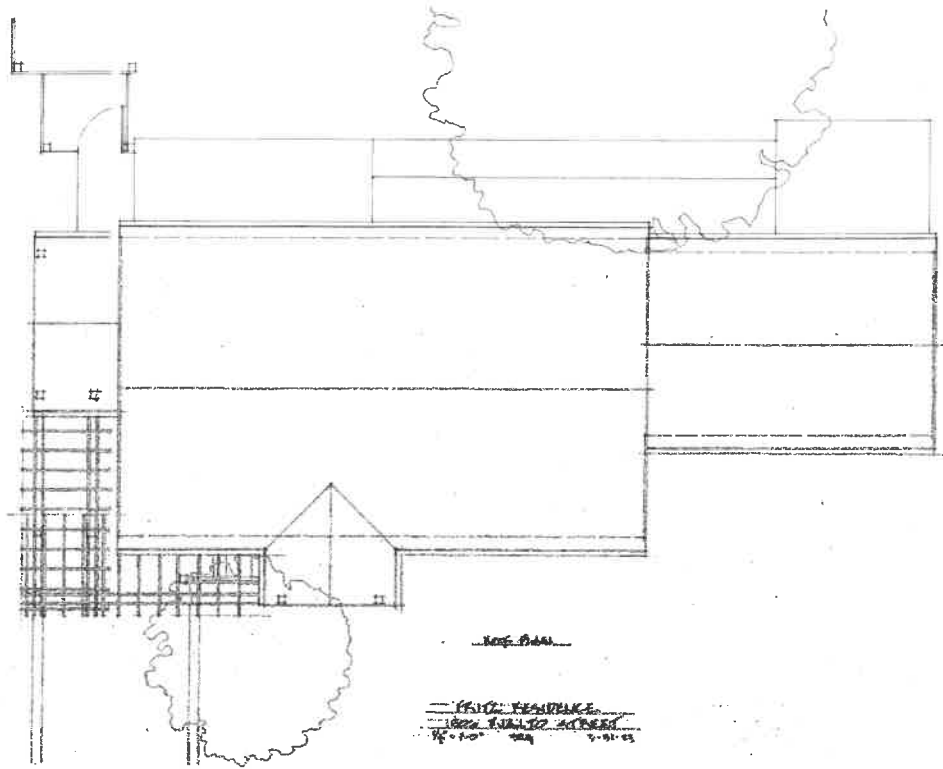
Draft plan of proposed improvements showing side patio with awning supports, rebuilt front steps, and connecting pergola.
